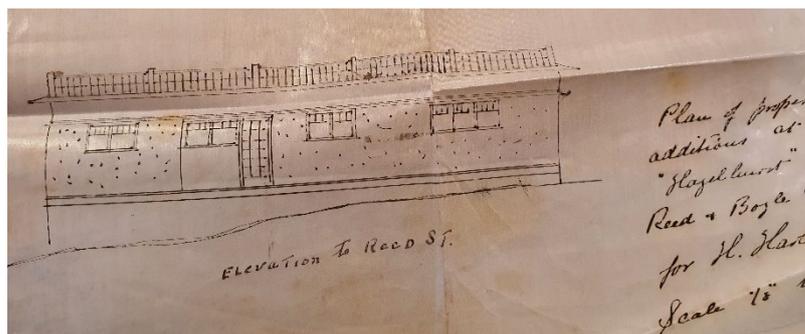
Elevation of an addition to Hazlehurst, prepared by Helier Harbutt and approved by Council in 1920 (BA 20/0007). This addition contained a billiards room as well as 2 bedrooms, kitchen, living room, bathroom, porch and verandah.
